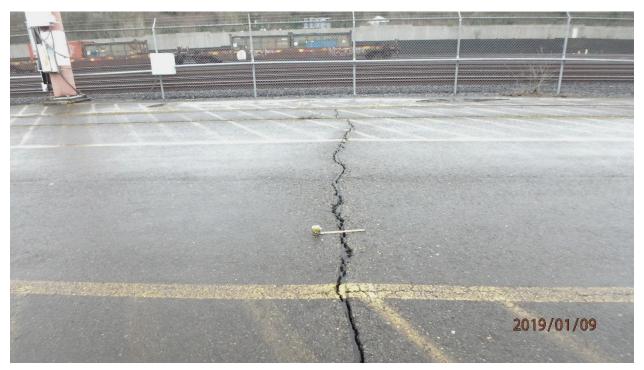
Crack as wide as 1.25 in.: RA-3 (map note 10)
